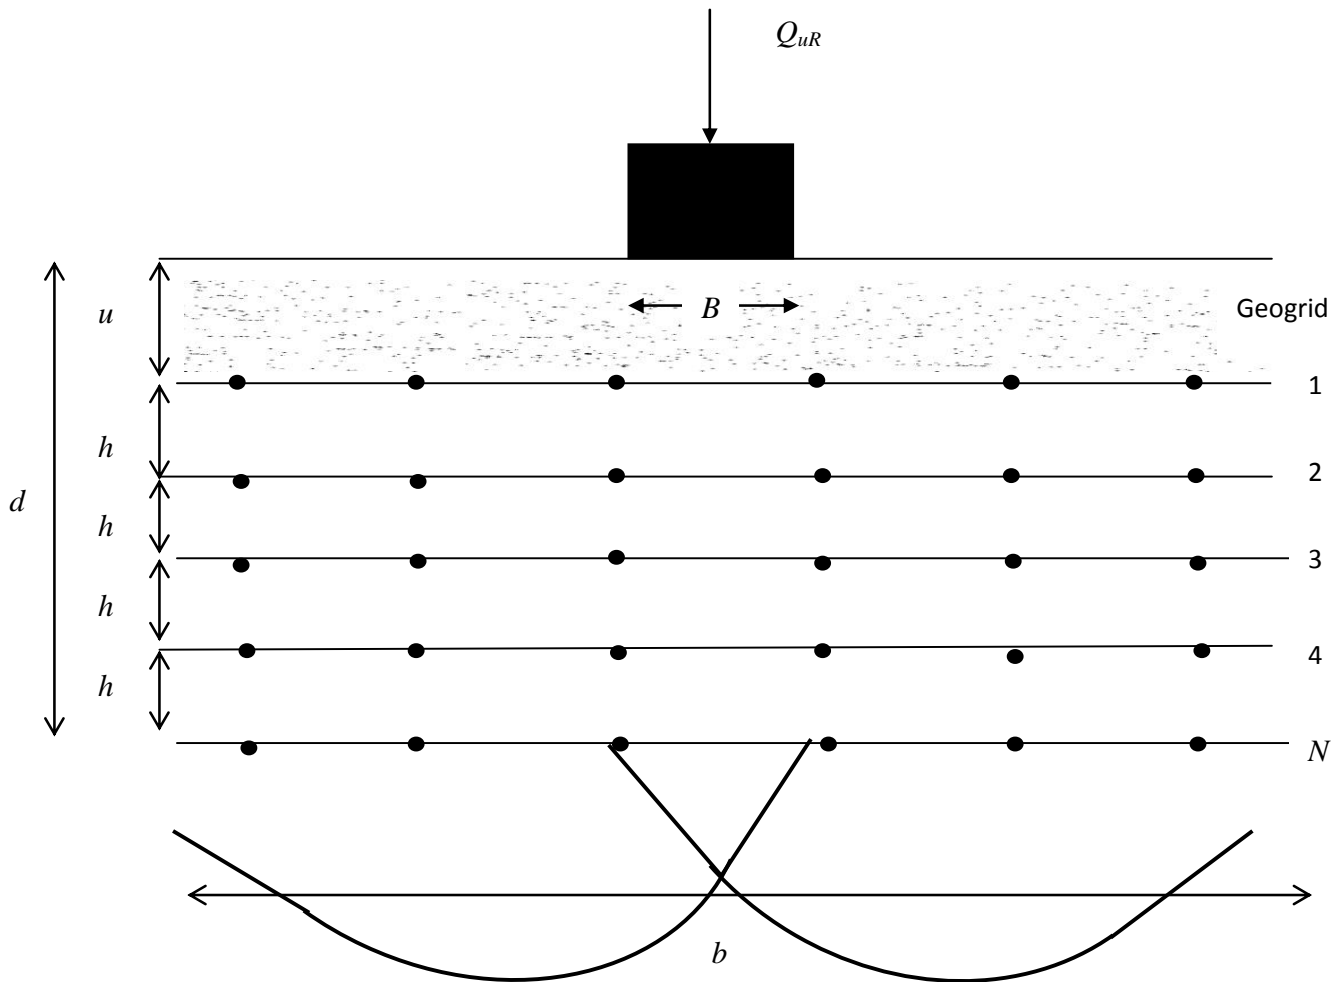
Assumed failure mode under a centrally loaded surface square foundation over geogrid-reinforced sand (Source Takemura et al. 1992)
